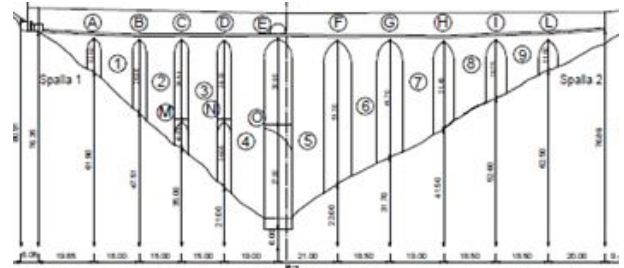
Longitudinal section of the bridge from south. Piers are number from West to East.
